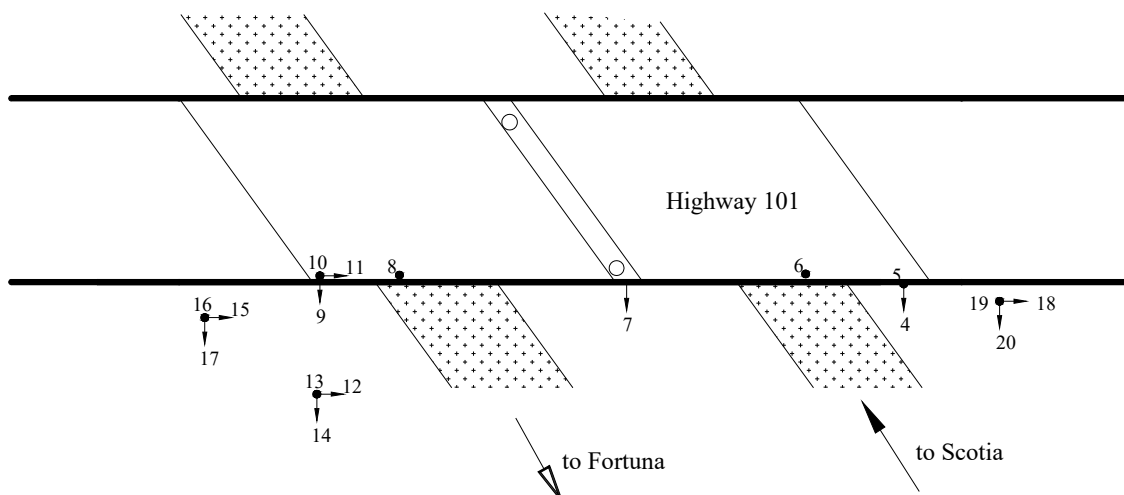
Plan view of the Painter Street Bridge and the position of the accelerometers
